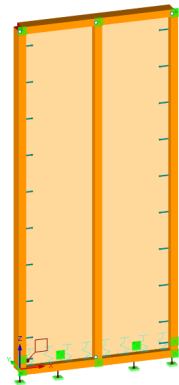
Visualization of a timber frame shear wall modelled with the proposed finite-element modelling strategy, method F.
